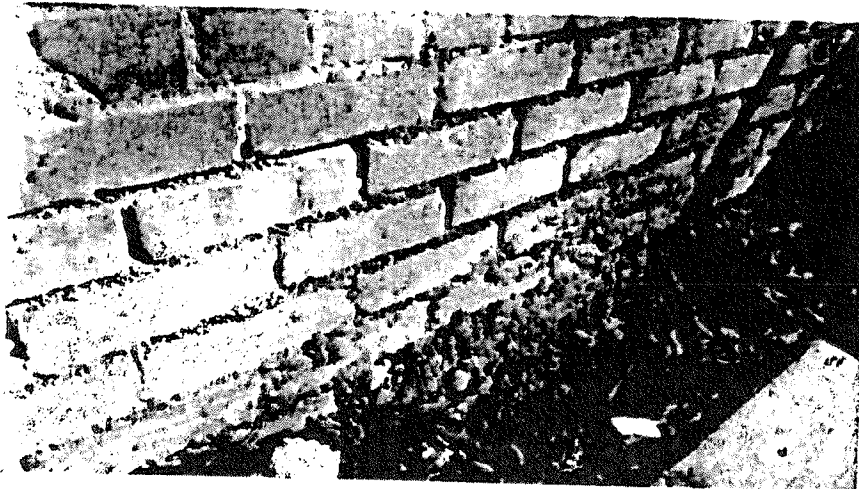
Deteriorated Mortar in wall between 1828 and 1830.
